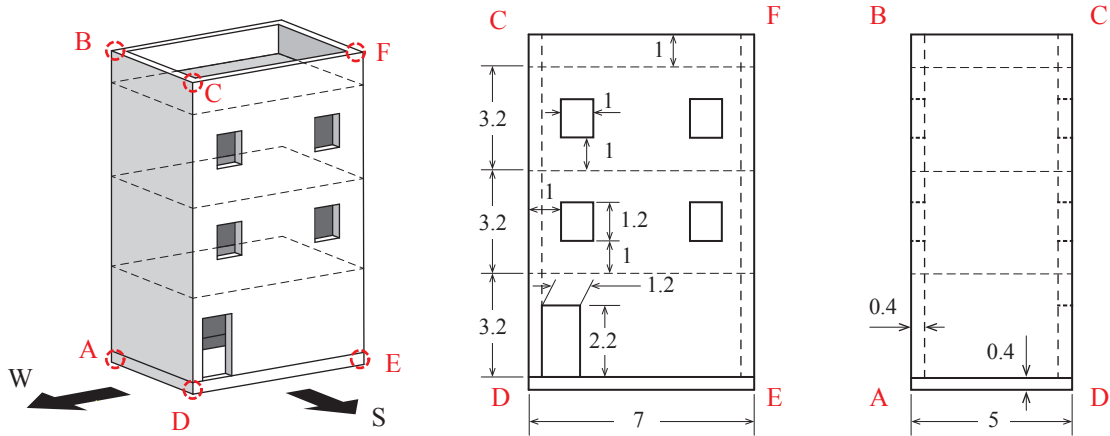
Plan dimensions of the three-dimensional masonry building (units in m).
